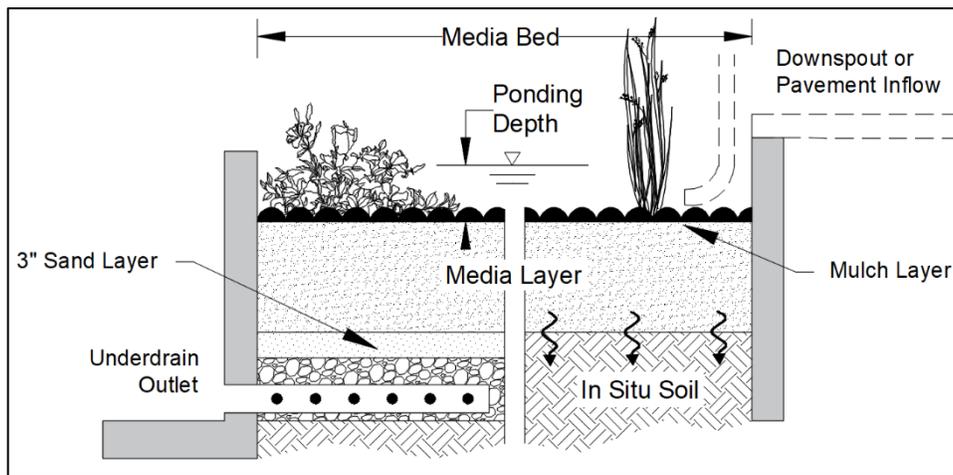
Joint Illustration of a Stormwater Planter or Rain Garden with Underdrain to the Left and with Infiltration to the Right (not to scale)
